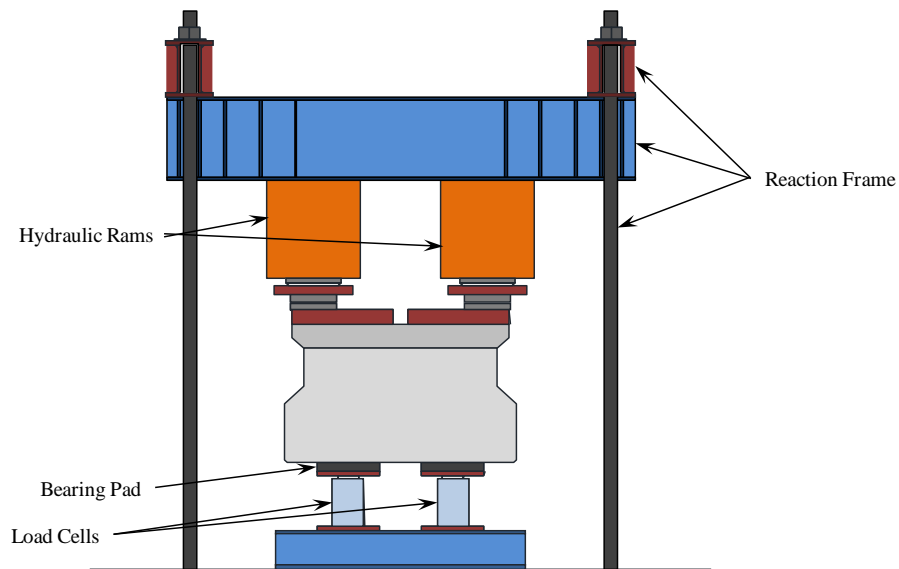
Front Elevation View of test setup for in-house fabricated beams.
